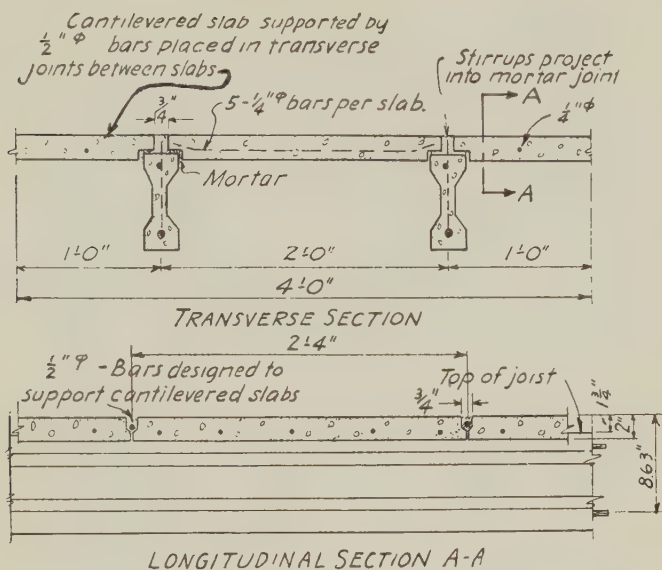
DETAILS OF BOND JOINT NO. 6 USED WITH 23 1/4 IN. BY 28 IN. PRECAST SLABS
